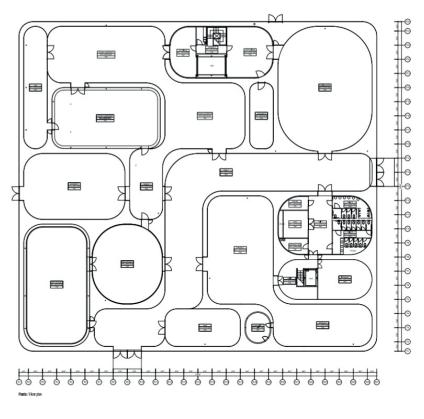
Ground floor plan, Toledo museum, SANAA (2001) • Source: El Croquis
